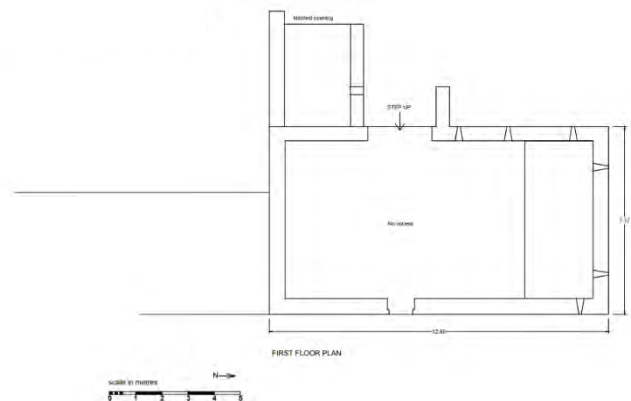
The first-floor plan of a bank barn on a farmstead, drawn by Lynne Seignot
